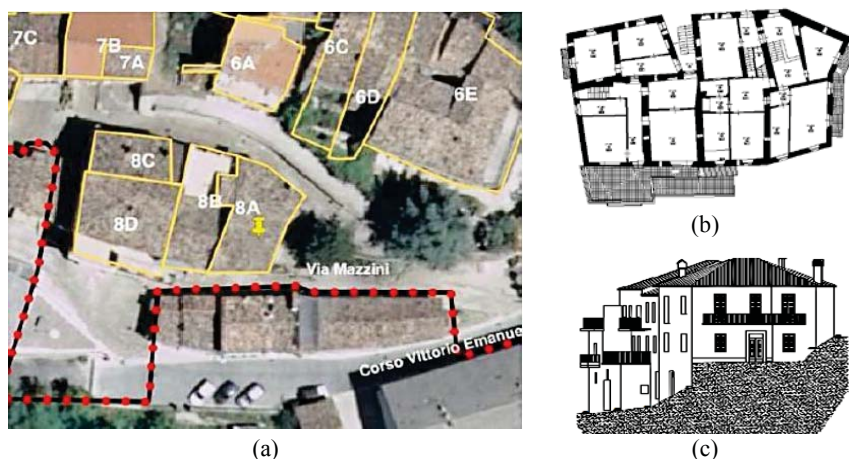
(a) In-plane configuration, (b) typical floor layout, and (c) South-West view of the studied building compound.
